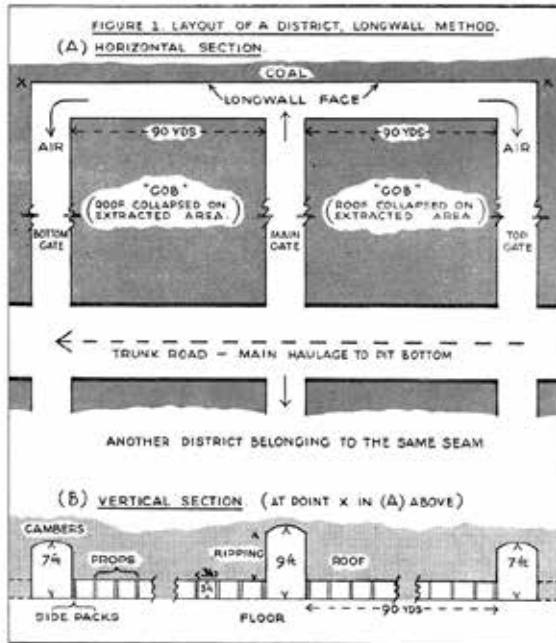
Maps how a longwall coal extraction system works spatially. Map A details the structure of the coalface and access points as a plan drawing, while B shows the “getting” method as a sectioned elevation drawing.
